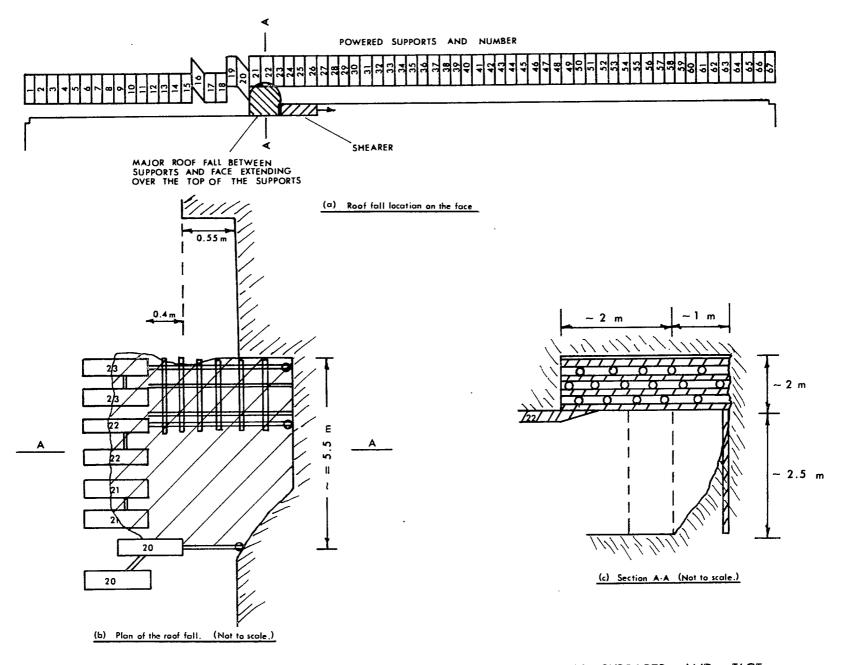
ROOF FALL OBSERVED ON FACE S35 BETWEEN SUPPORTS AND FACE
